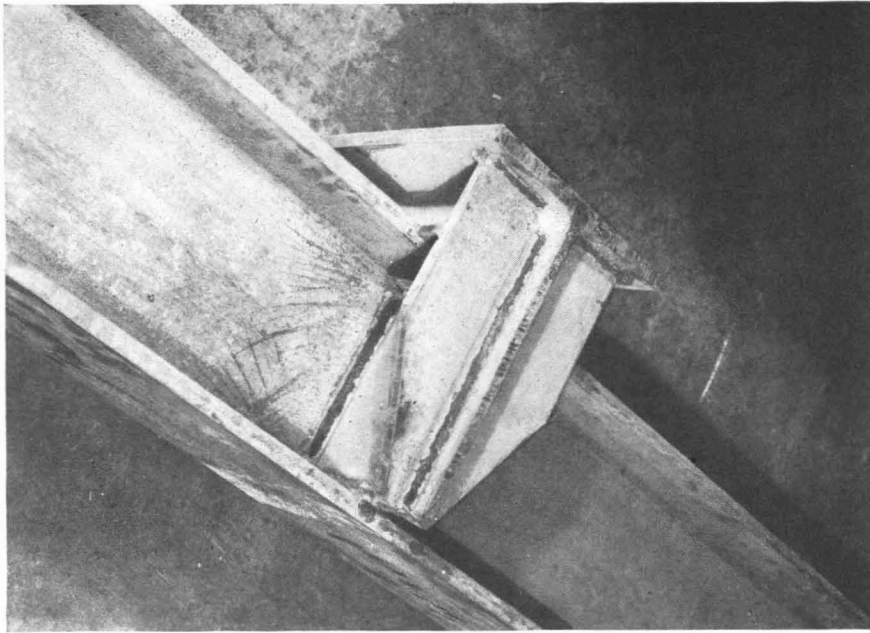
Surface yield lines produced by welding load carrying stiffeners
